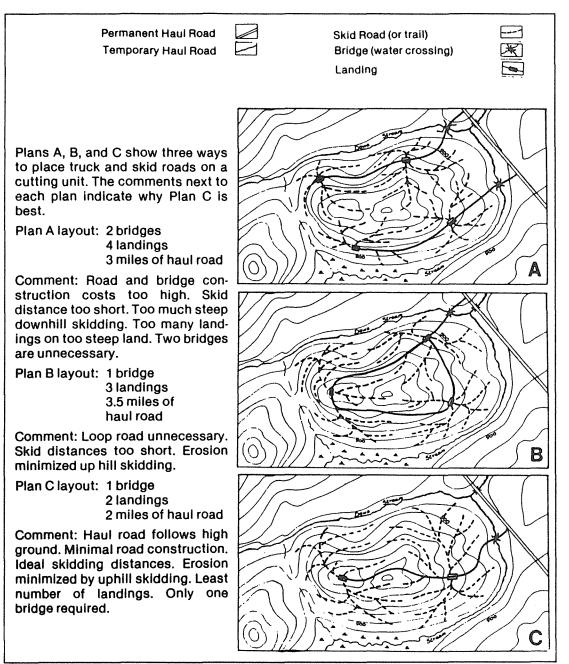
How to select the best road layout (Hynson et al., 1982).
